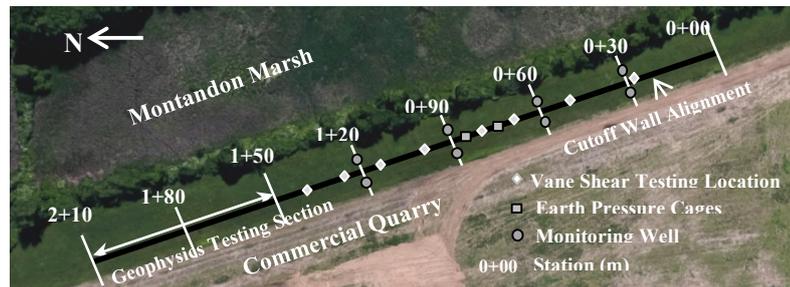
Plan diagram of the cutoff wall with locations of the monitoring wells and the vane shear testing points.
